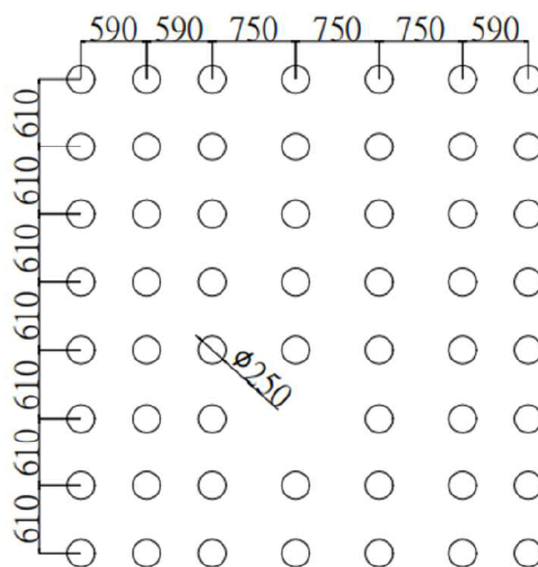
Recommend Footprint Dimension (Top view, unit: mm)
